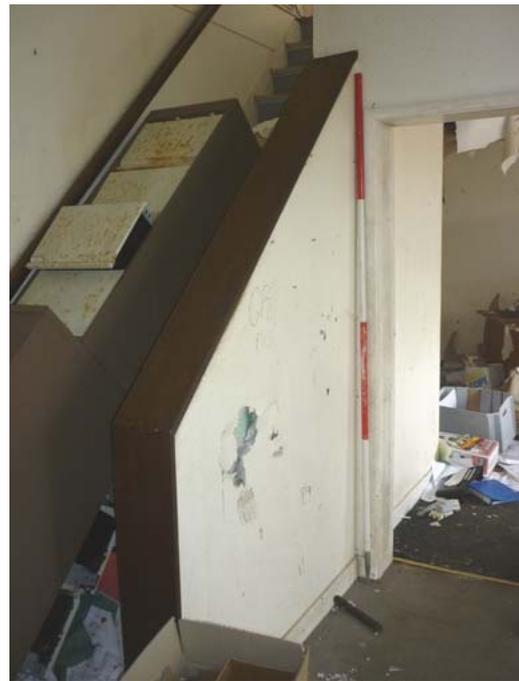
(right): General view of ground floor Room 1, Building 2, viewed from the west
